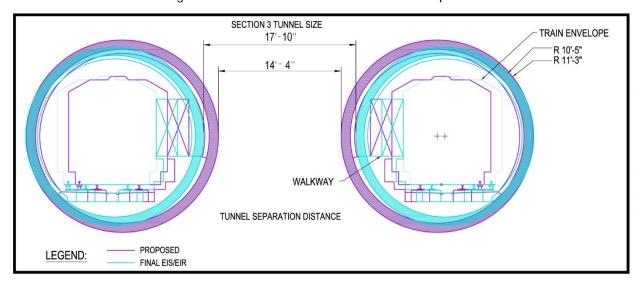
Tunnel Size – Final EIS/EIR and Proposed
